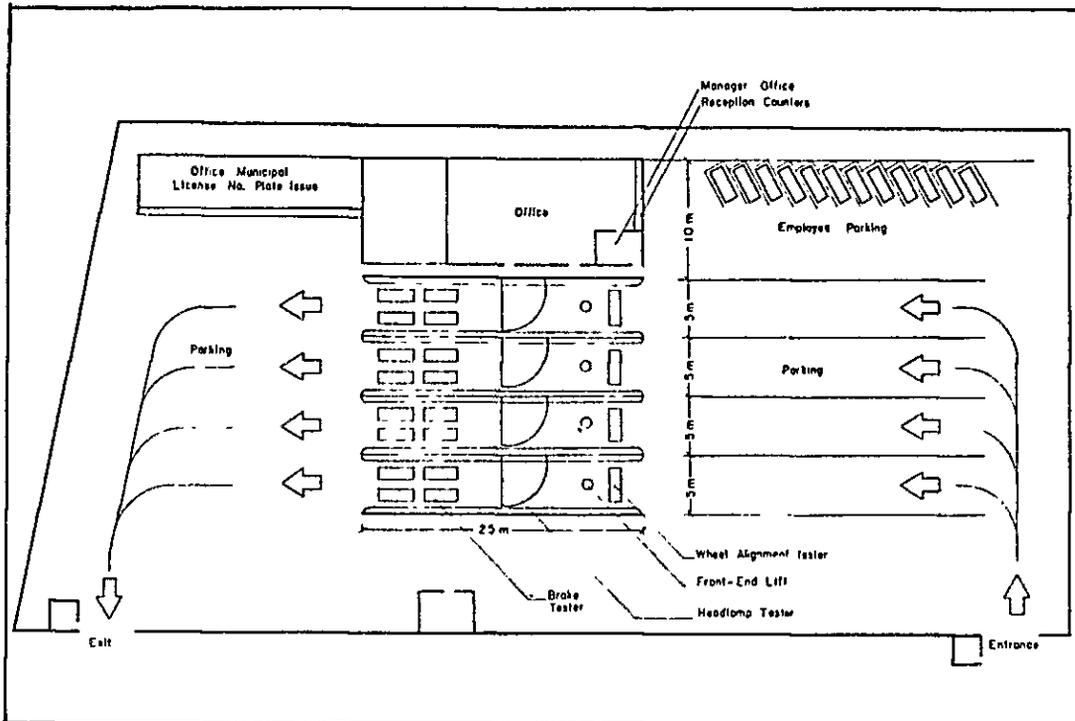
PAITILLA COMMERCIAL VEHICLE INSPECTION CENTER LAYOUT
